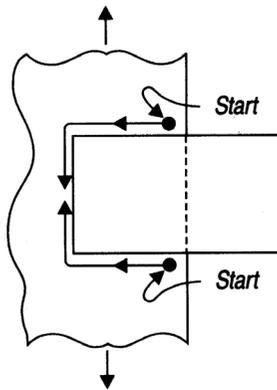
Suggested direction of welding travel to avoid notches.
